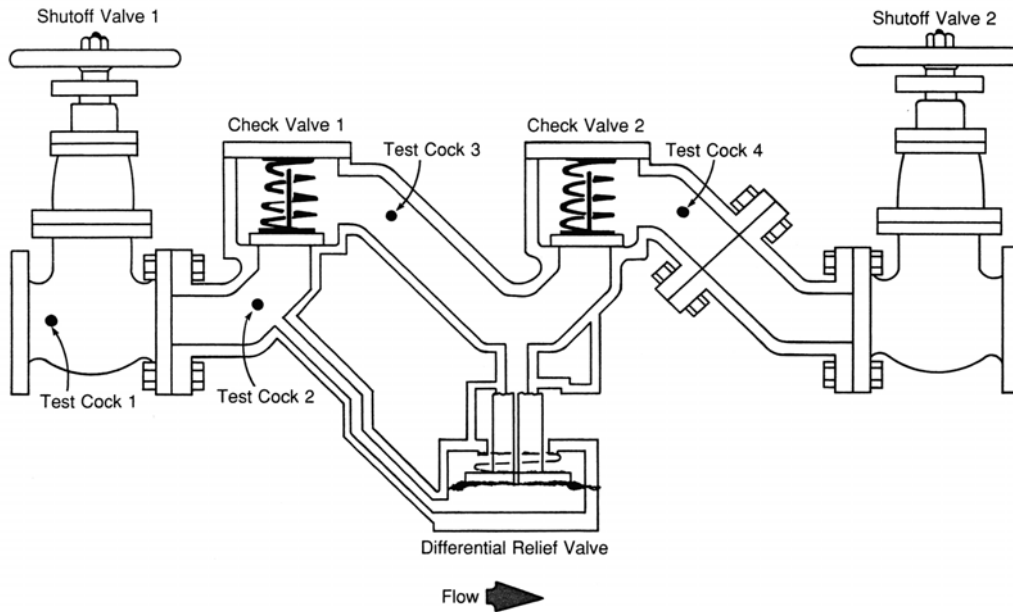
Schematic of Reduced Pressure Zone Device ⁷
